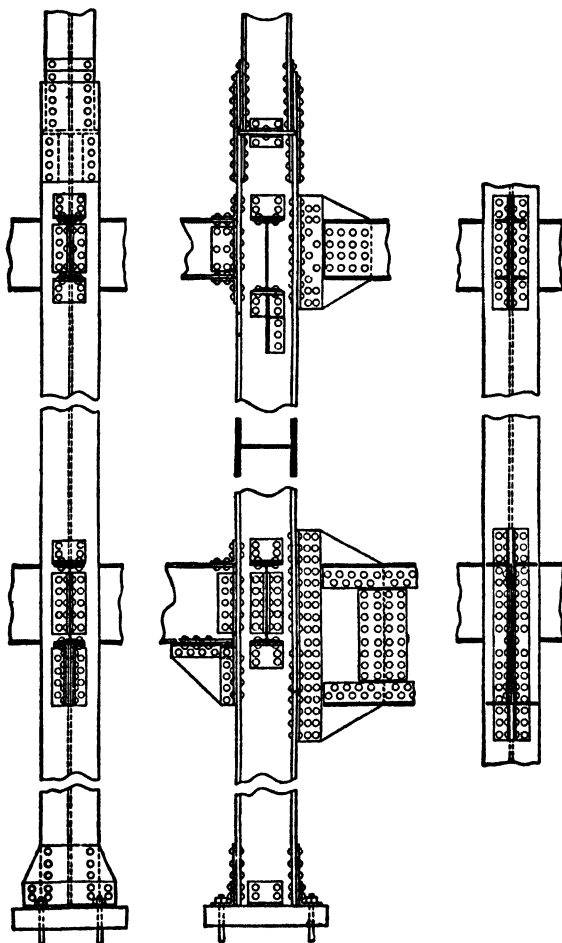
Typical Bethlehem H Column Wind-Bracing Connections
